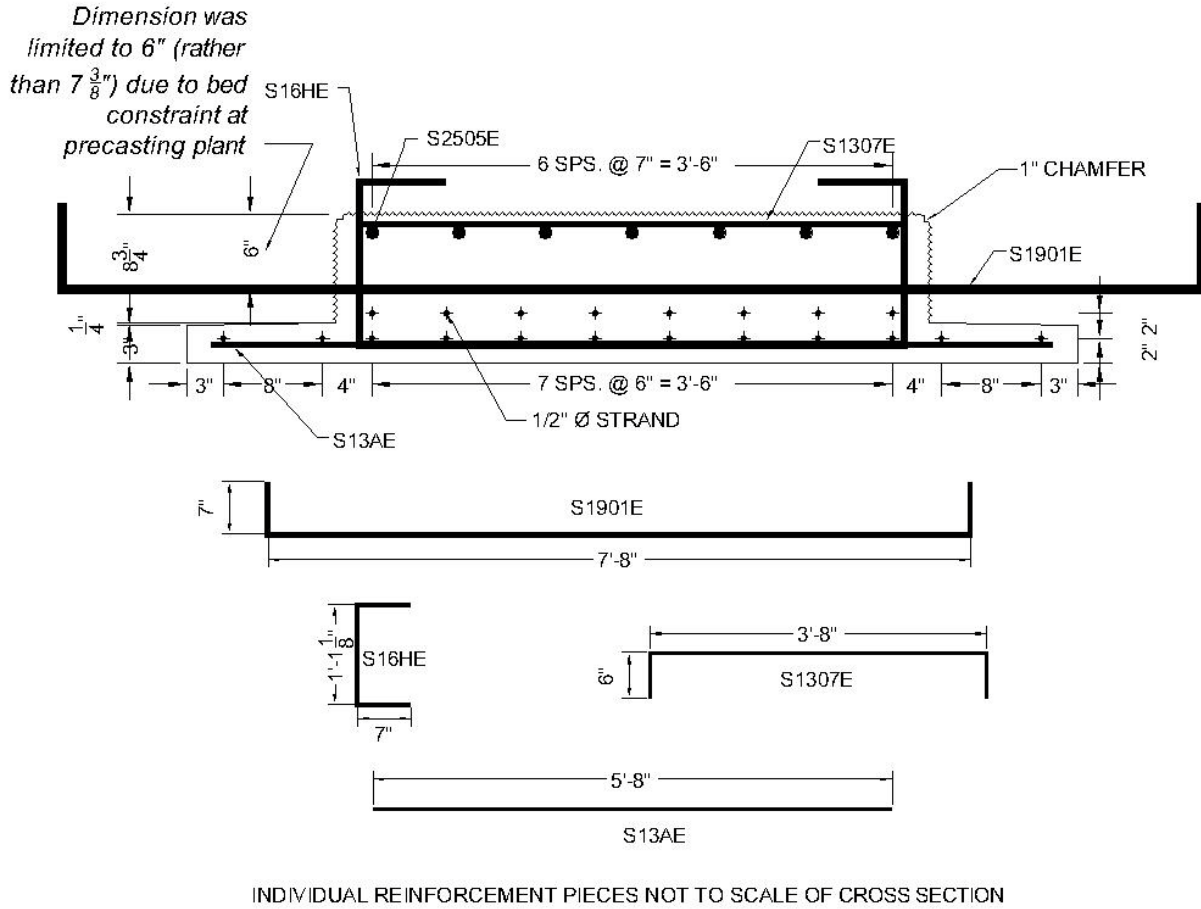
Cross section and individual reinforcement details for midspan of precast beam 1S
